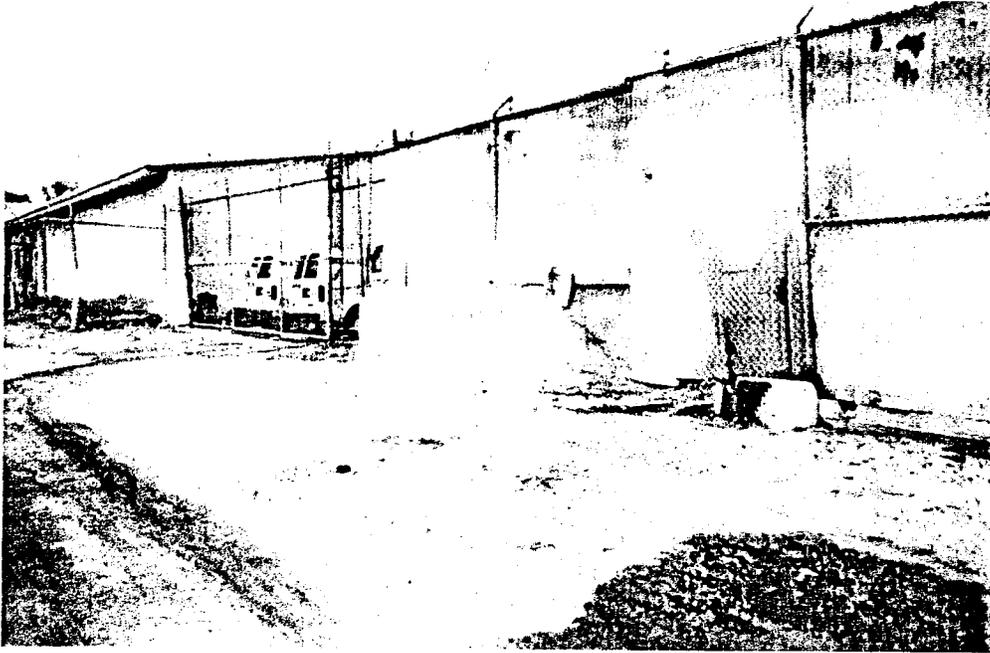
A rusted corrugated steel industrial building located on Worth St.
